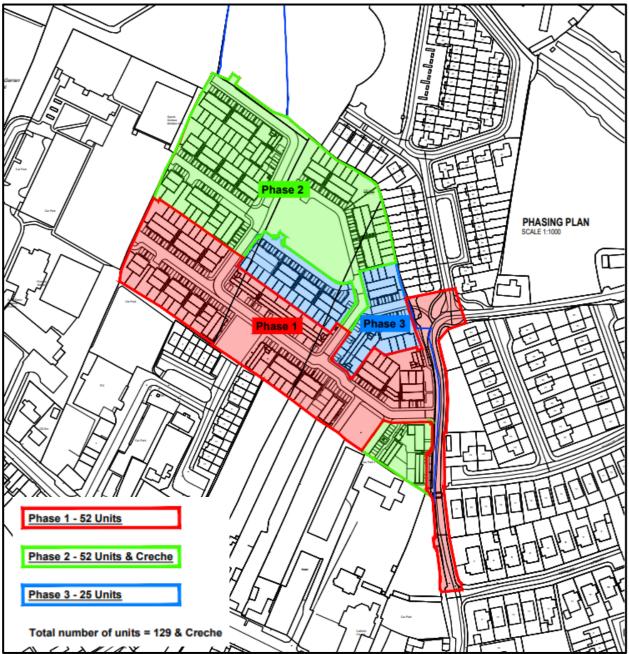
Phasing Plan (Source: MCORM Architecture)
